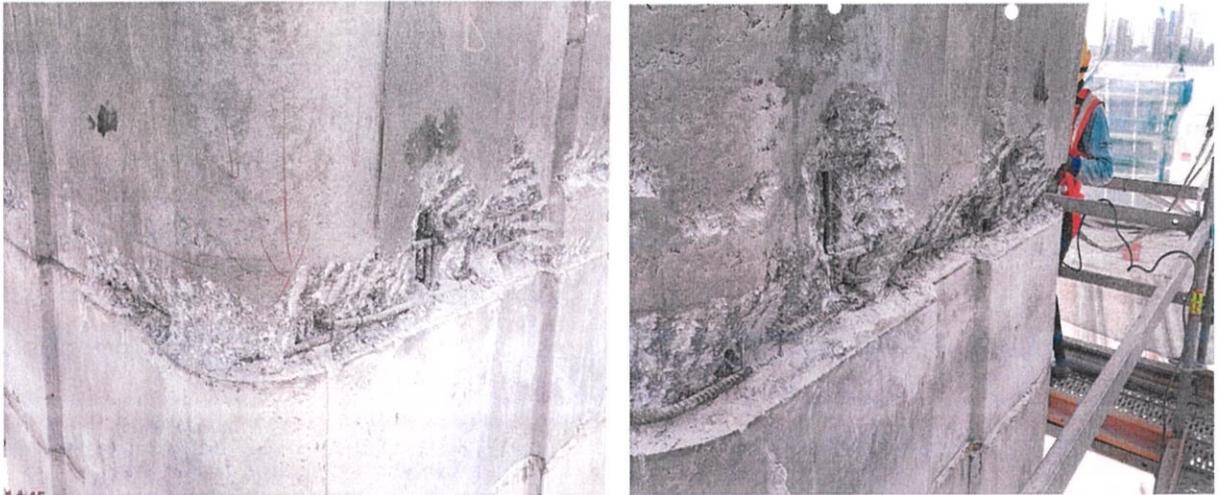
A localized severe honeycomb at pier column and pier head construction joint at TNEN15 Kampung Malaysia. The root cause is insufficient of vibration during concreting works. This is NCR-00679
